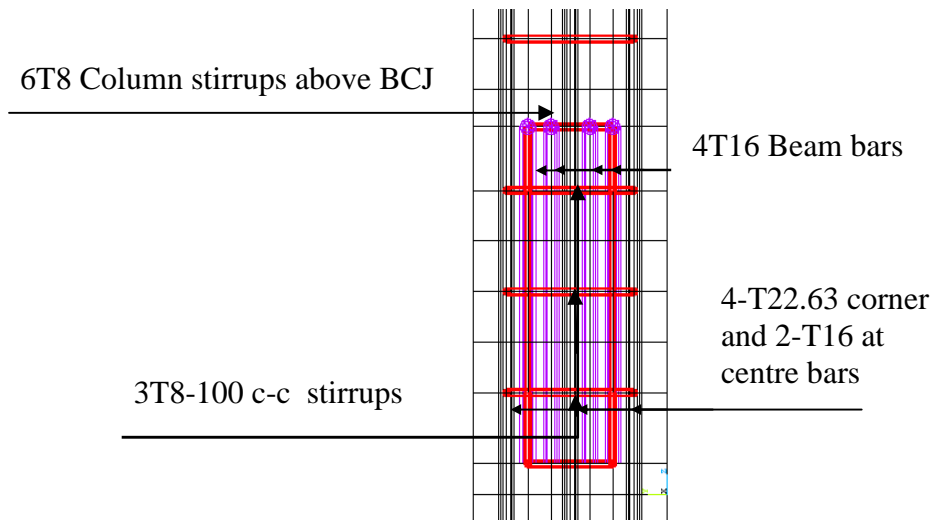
Section A-A of the numerical model of beam column connection showing the cross section of the beam at BCJ for BCJ-B
